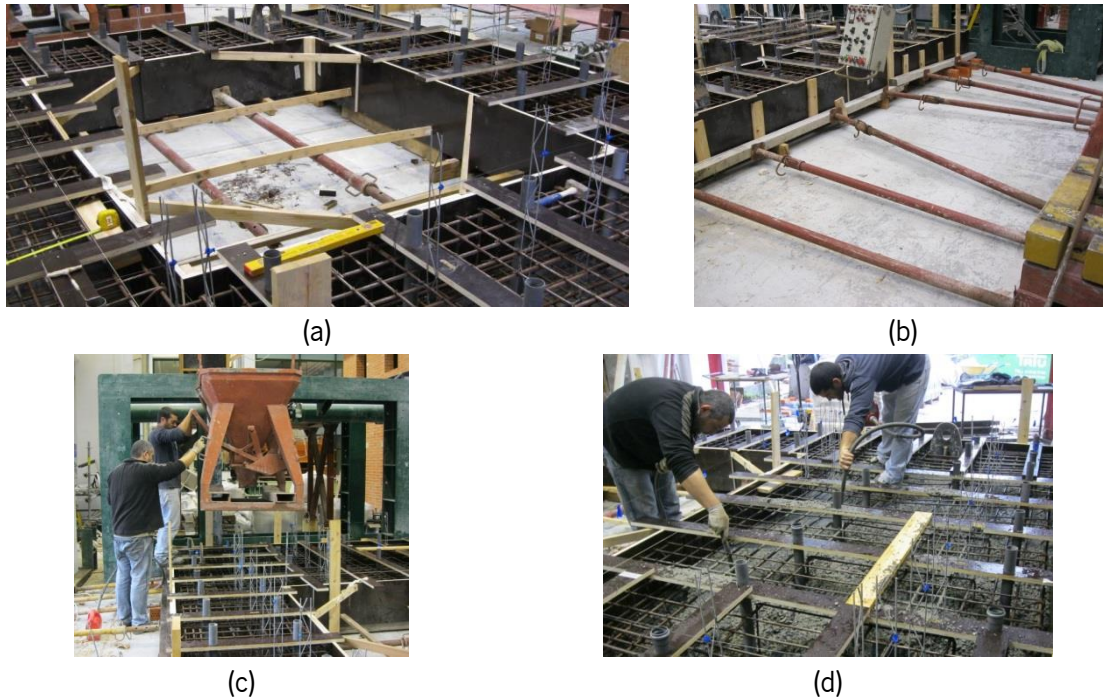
Foundation construction: (a) internal restraining metal poles, (b) external restraining metal poles, (c) concrete pouring and (d) spreading with vibrators
